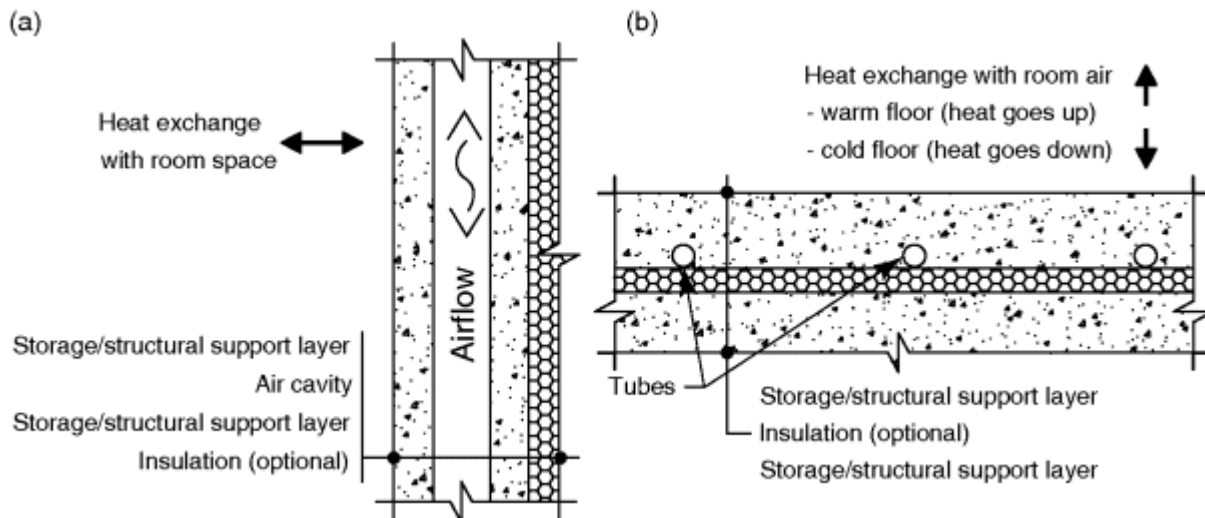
Schematic of the typical cross-sections of (a) ventilated and (b) hydronic systems (either system can be a floor, wall, or roof; insulation is optional and can be placed on the other side of the tube to orient heat flow in the opposite direction) (Chen, Athienitis, and Galal, 2013)
